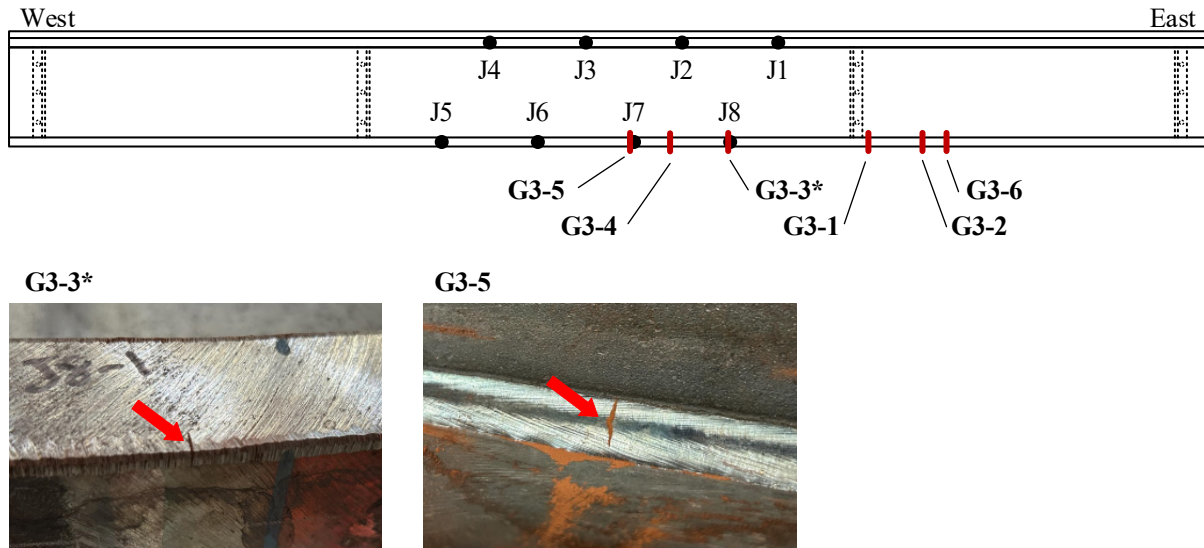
Illustration. Instrumentation layout for Girder 3 - Flange 1 (looking north).
